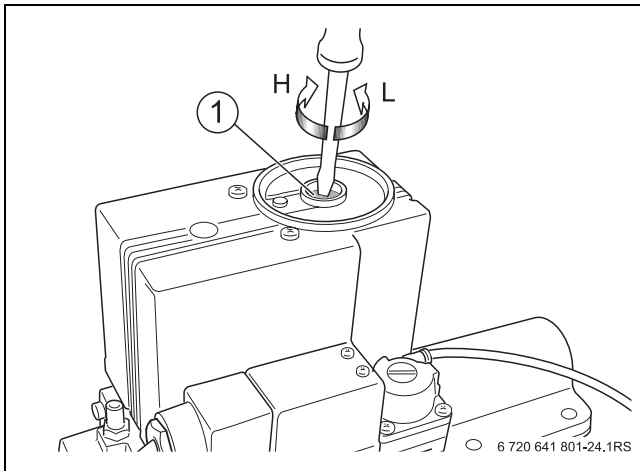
Conversion to a different gas type (boiler size 160 kW)
